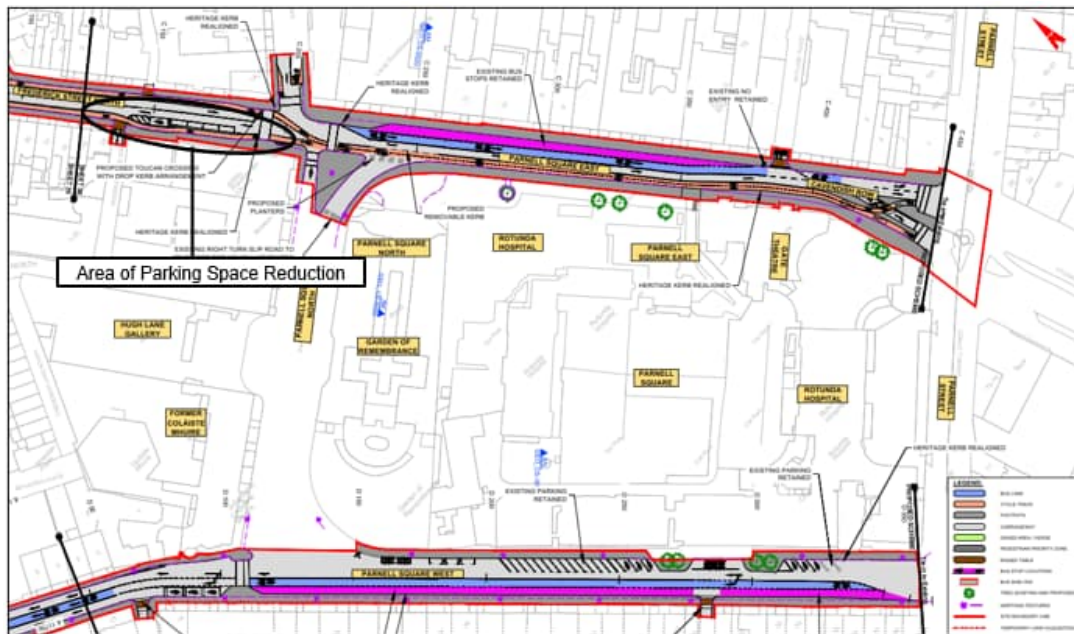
Commercial Parking Impact: Paid Parking – Frederick Street North
